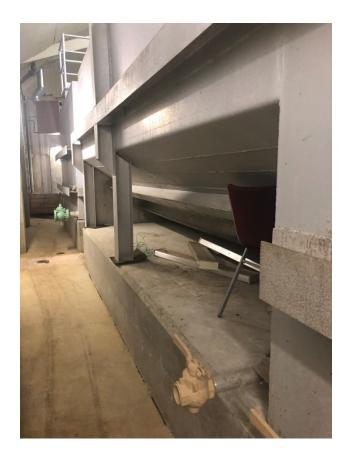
Keys Road Filters are not anchored to concrete foundation block.
